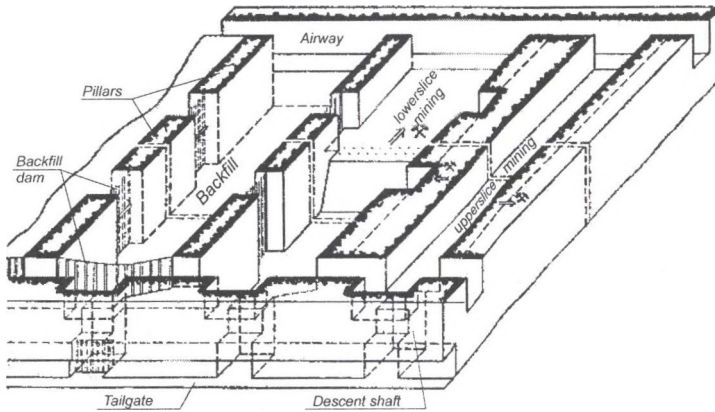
Example of a room and pillar Zn-Pb ore mining system with backfill
